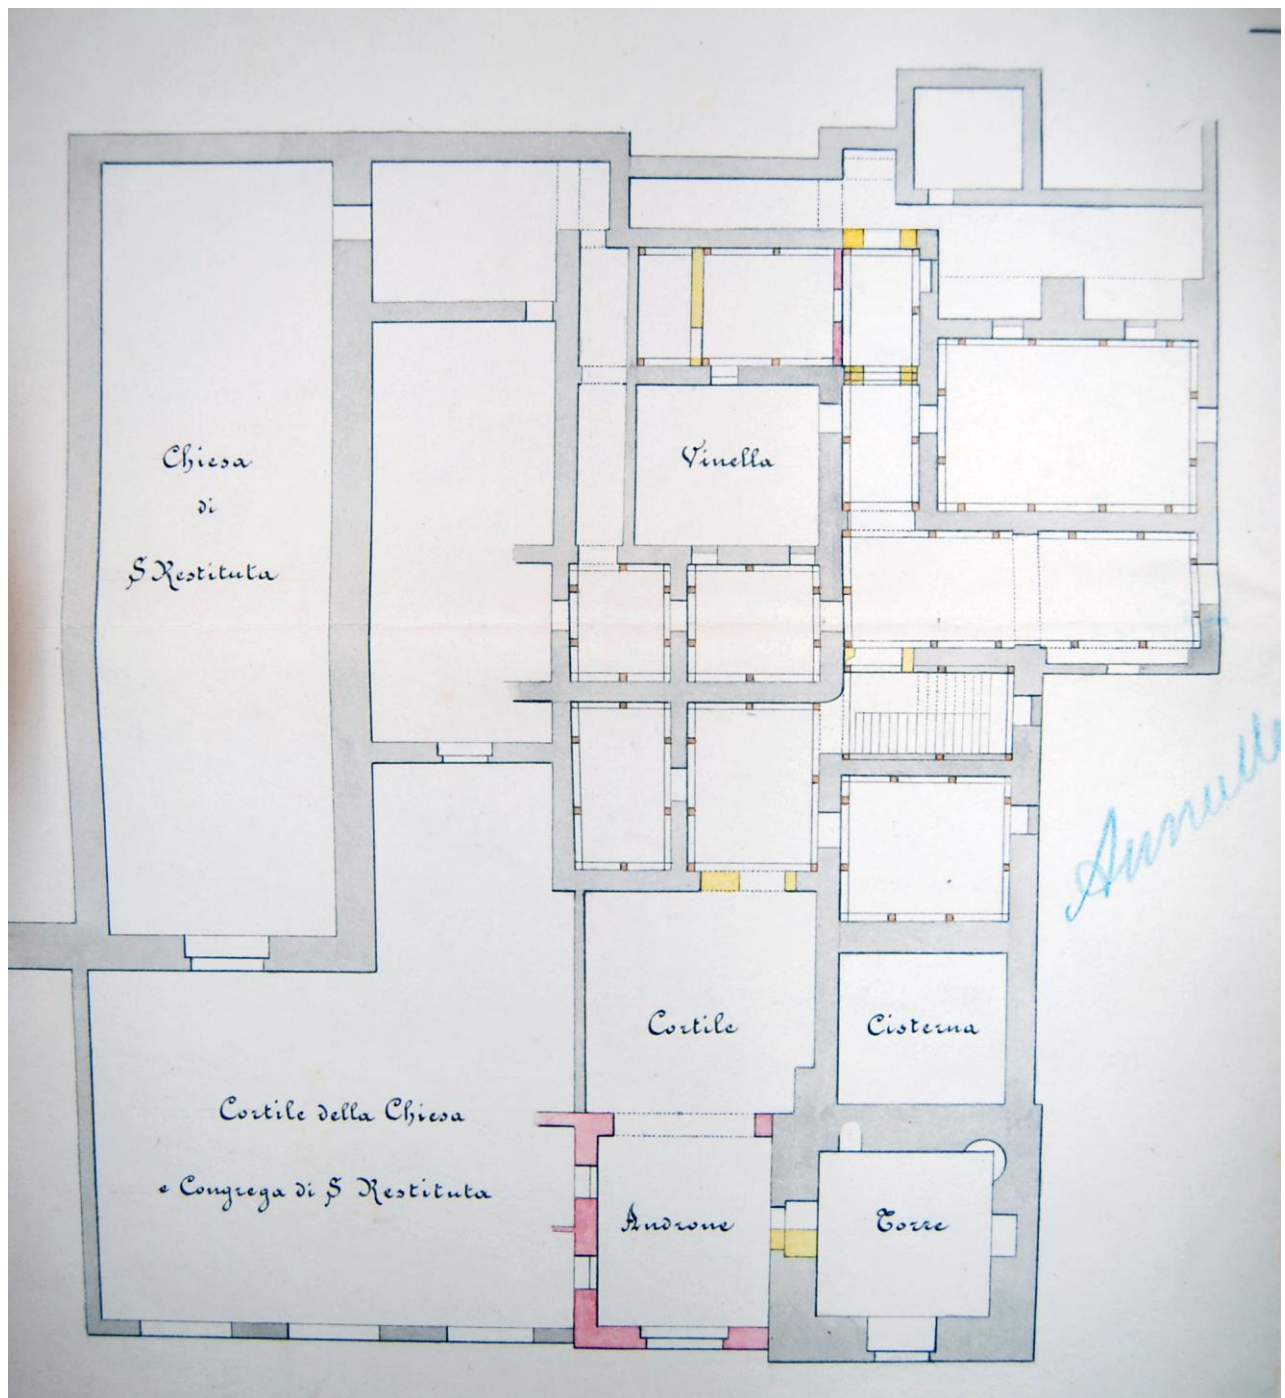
Ischia, Lacco Ameno, the new town hall design in the former St. Restituta's monastery (1885), ground floor (NaSA).
